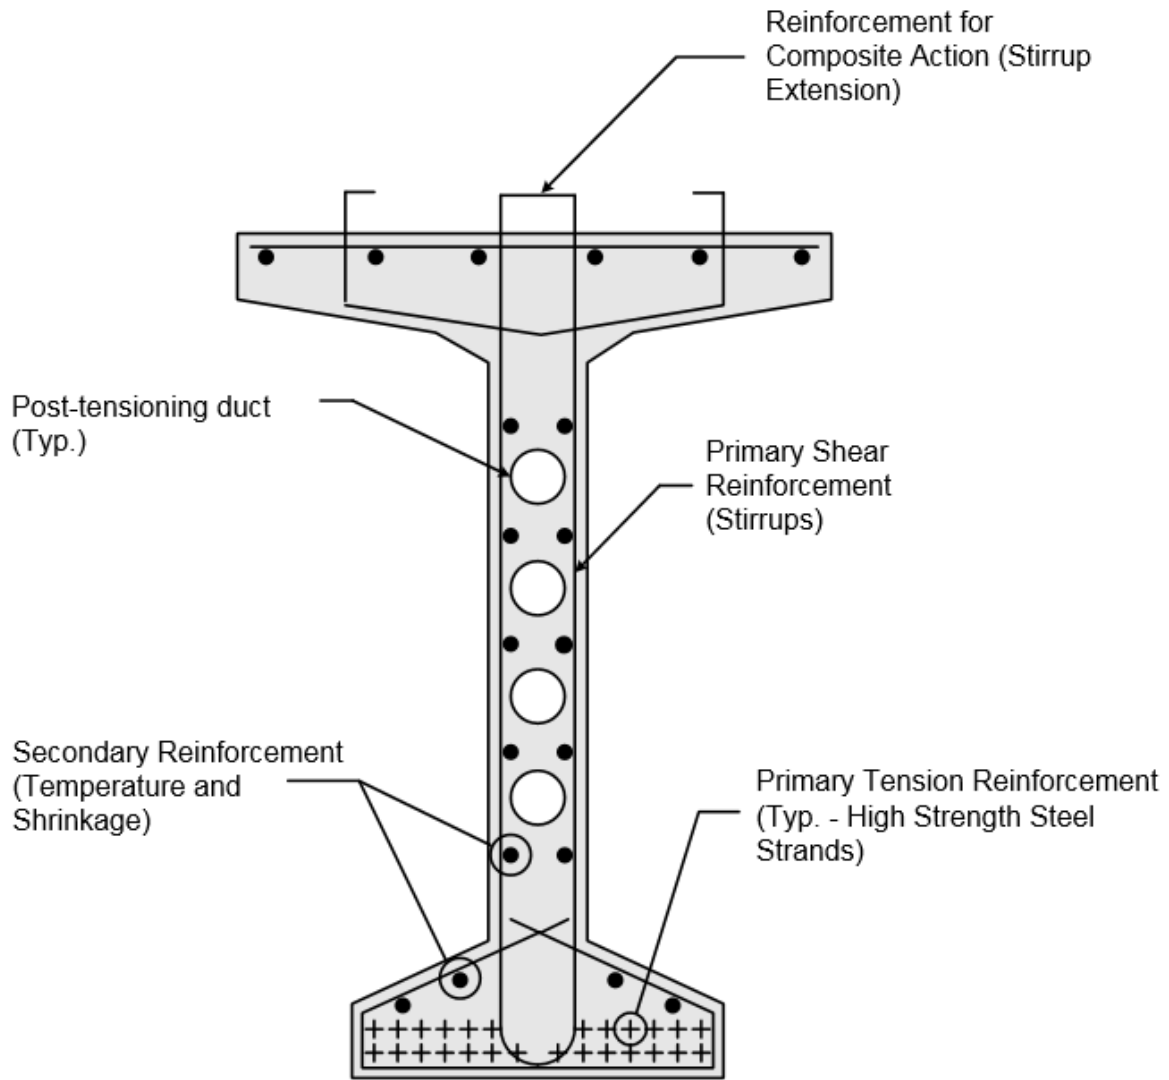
Steel Reinforcement in a Prestressed Bulb Tee Beam
